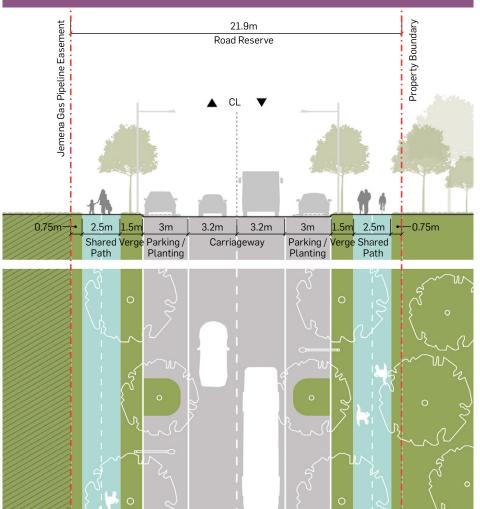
Indicative Street Section B-B' - Major Collector Road - Type 3
